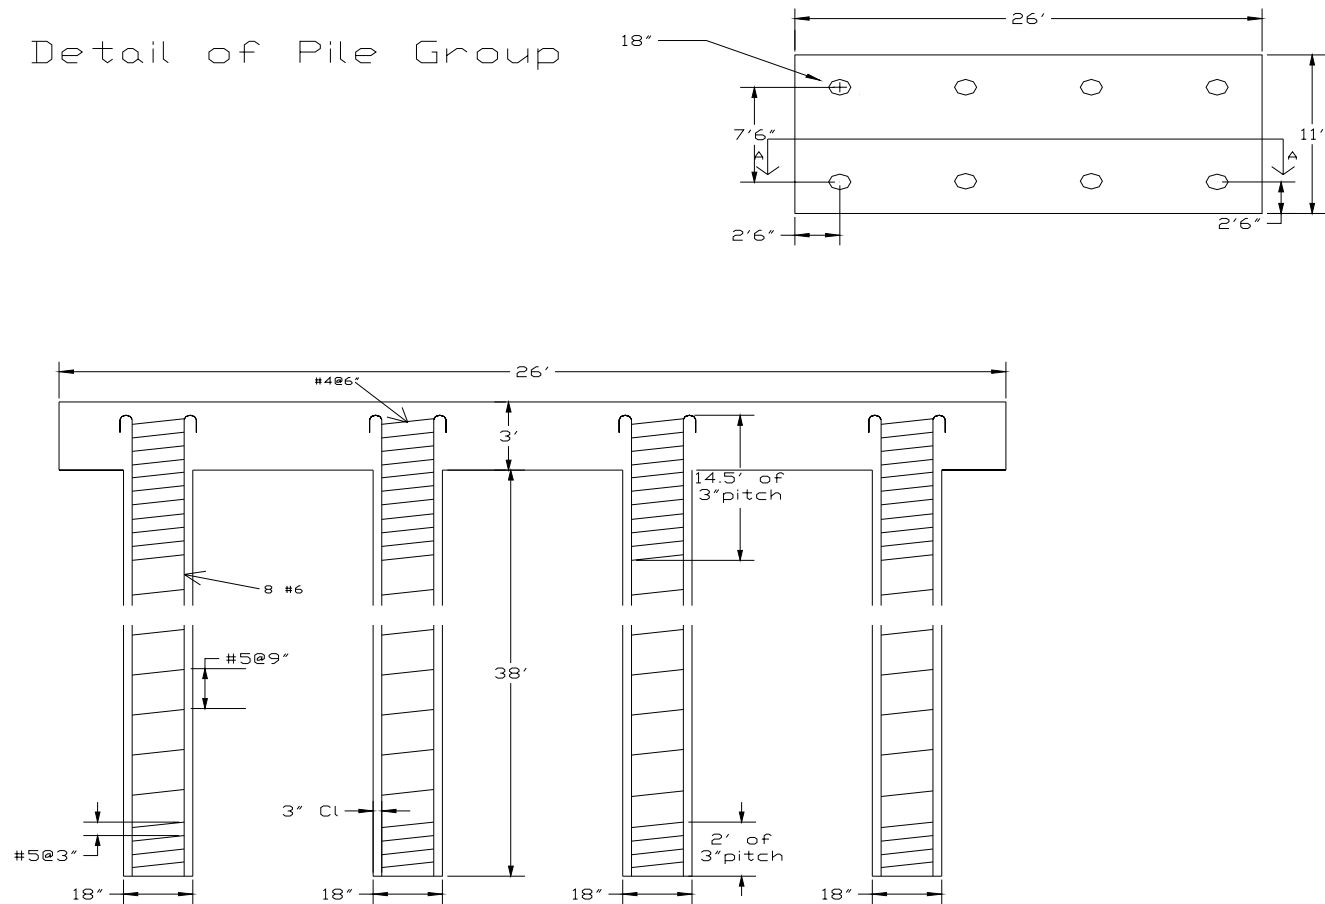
AASHTO Foundation Design Details for Fixed and Expansion Bents
